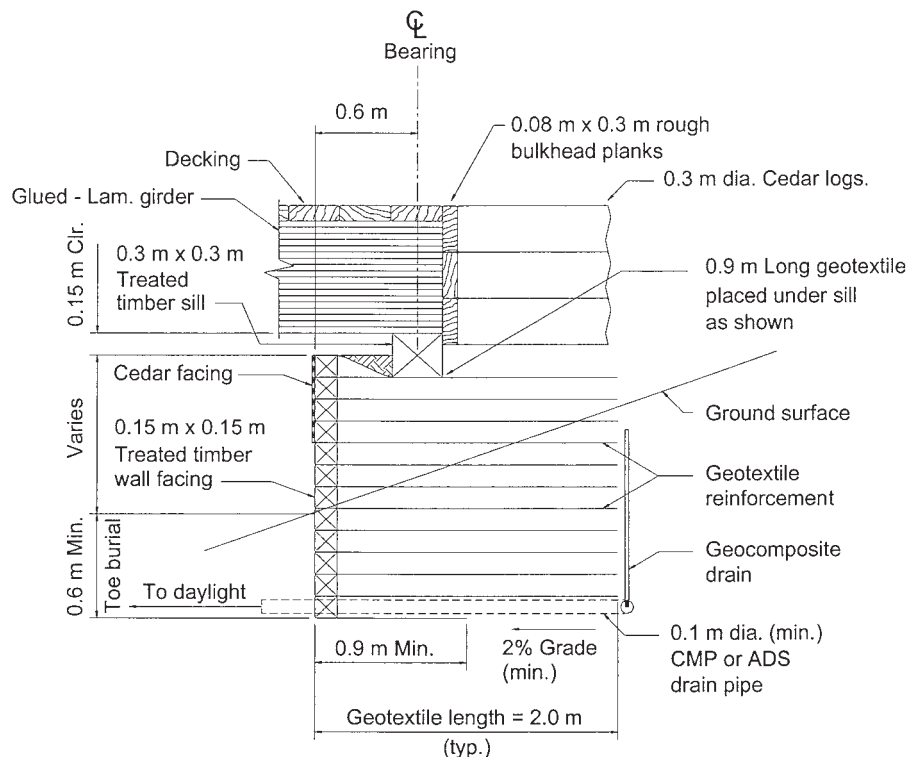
Cross-section of the Feather Falls Trail bridge abutments, California (Keller and Devin, 2003).
